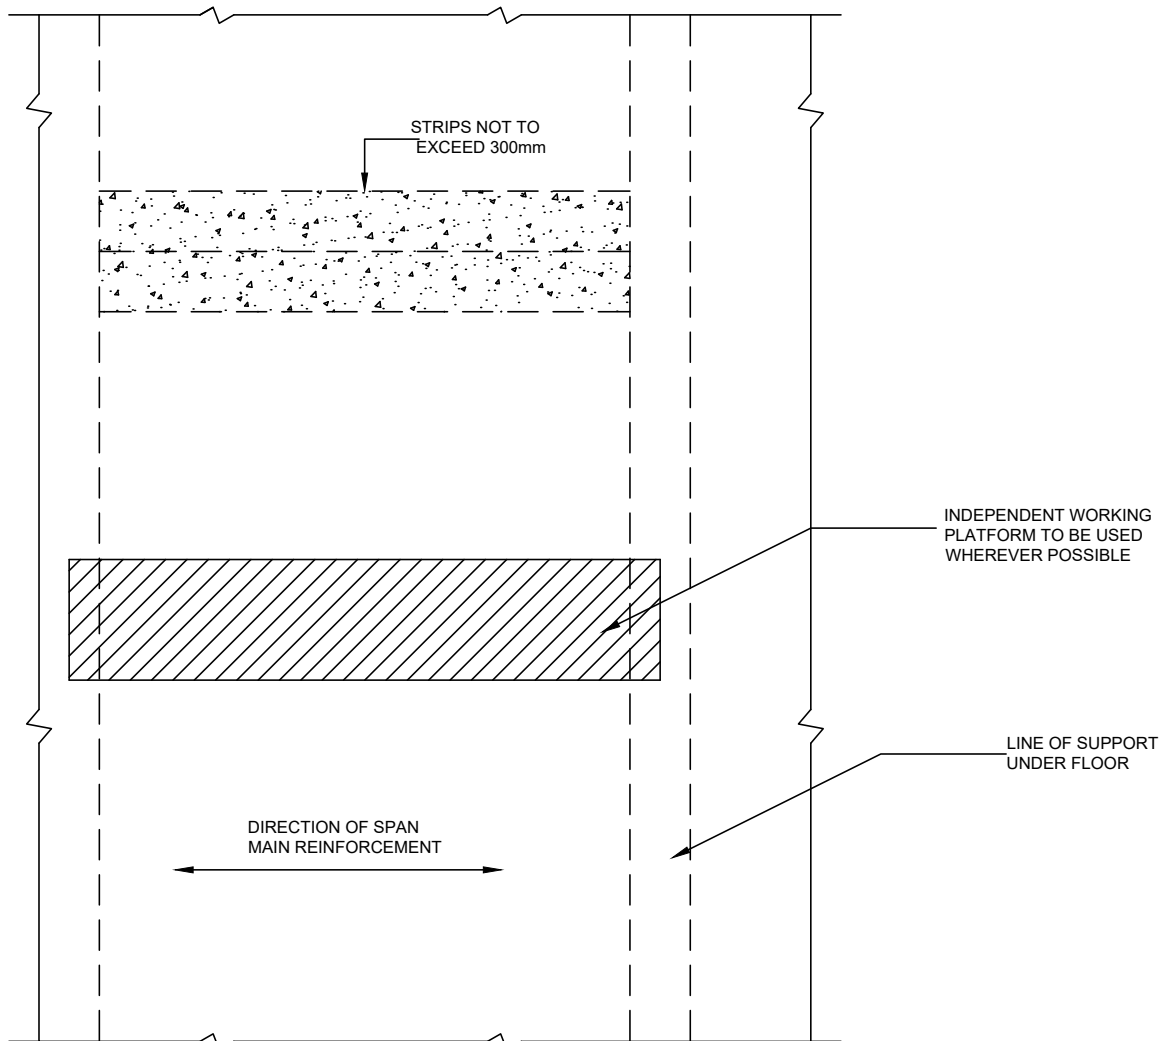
PLAN VIEW OF DEMOLITION OF REINFORCED CONCRETE FLOORS
